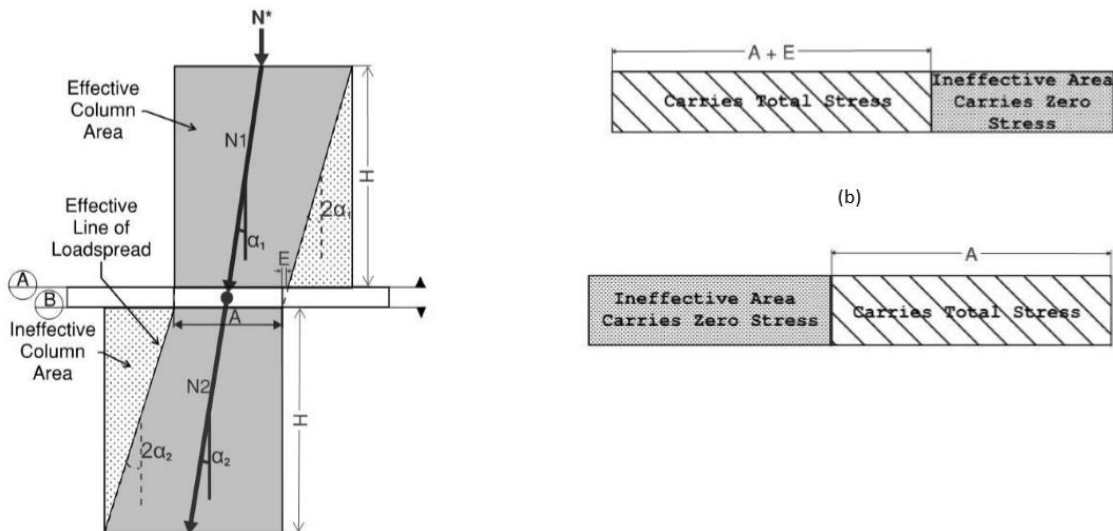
STM model: (a) Analytical Fan Shaped model; (b) Section A effective cross section column above (c) Section B effective cross section column below.
